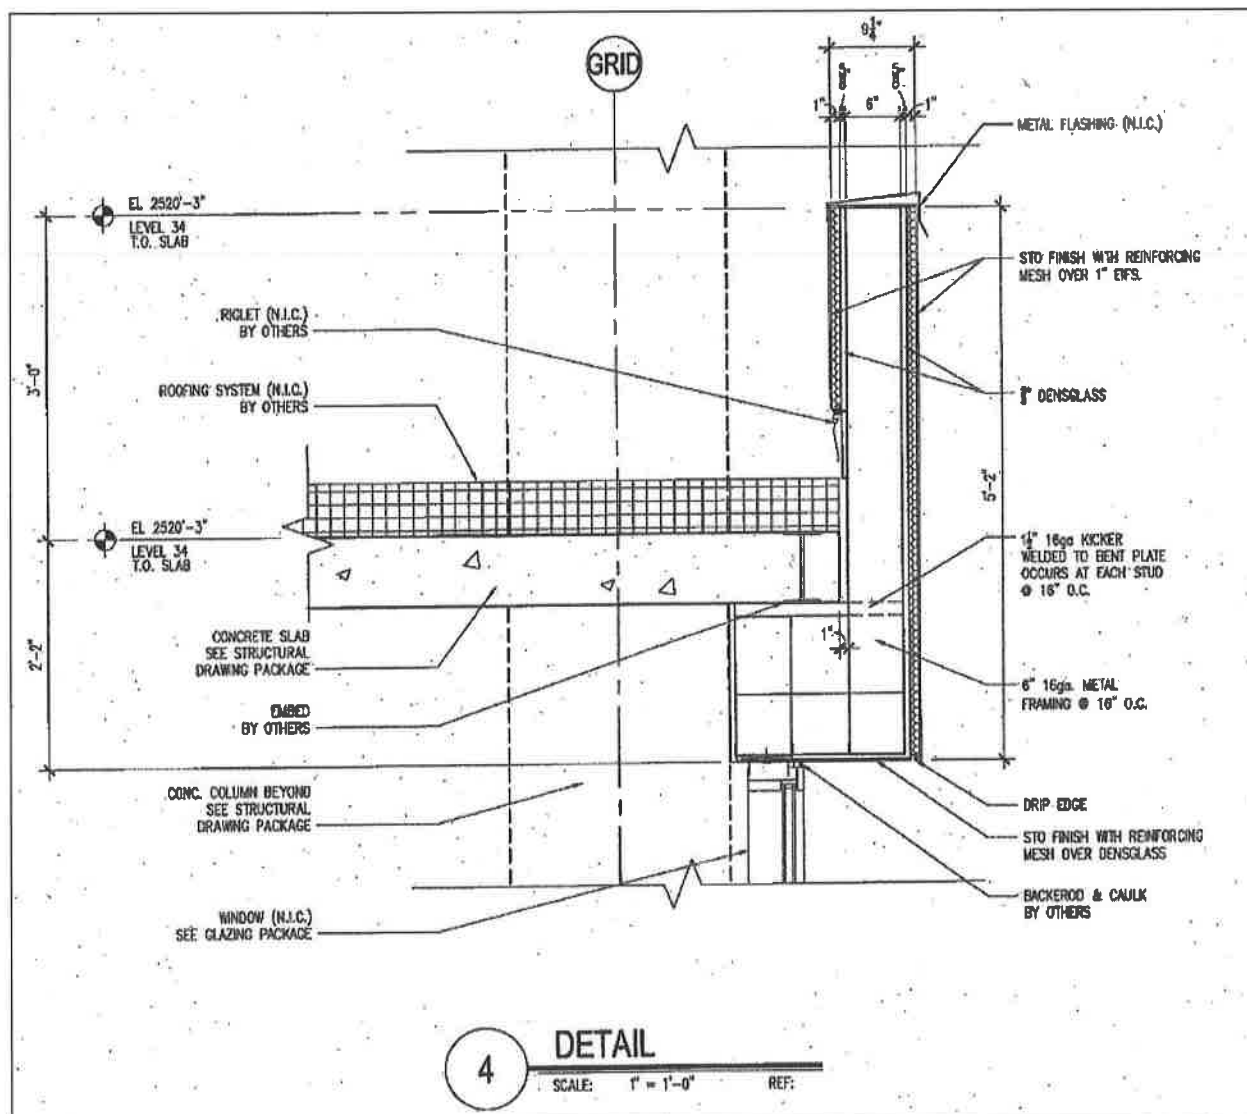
Construction Drawings: EIFS Shop Drawing Detail 4 Showing no Head Flashing
